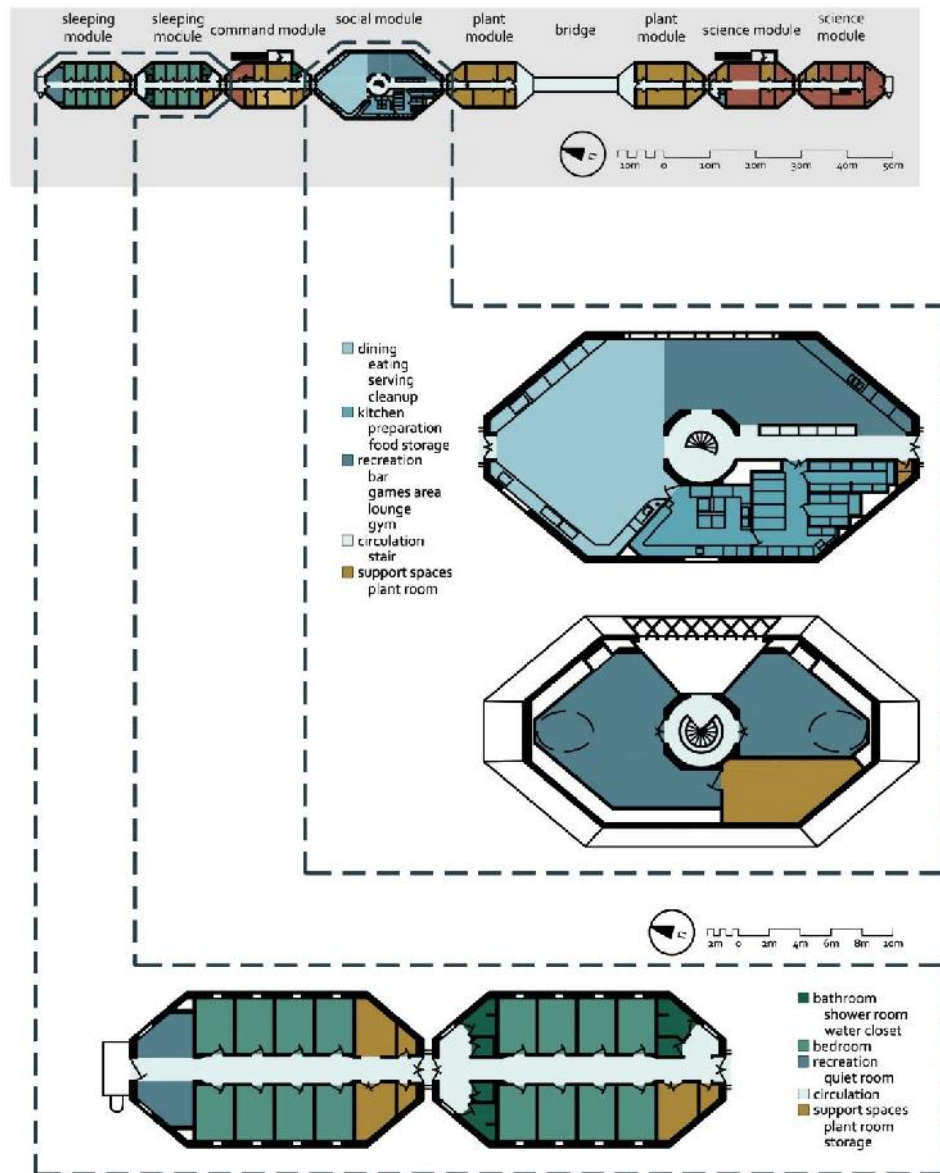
Halley VI – Site, Orientation, Floor Plan³⁶⁶
